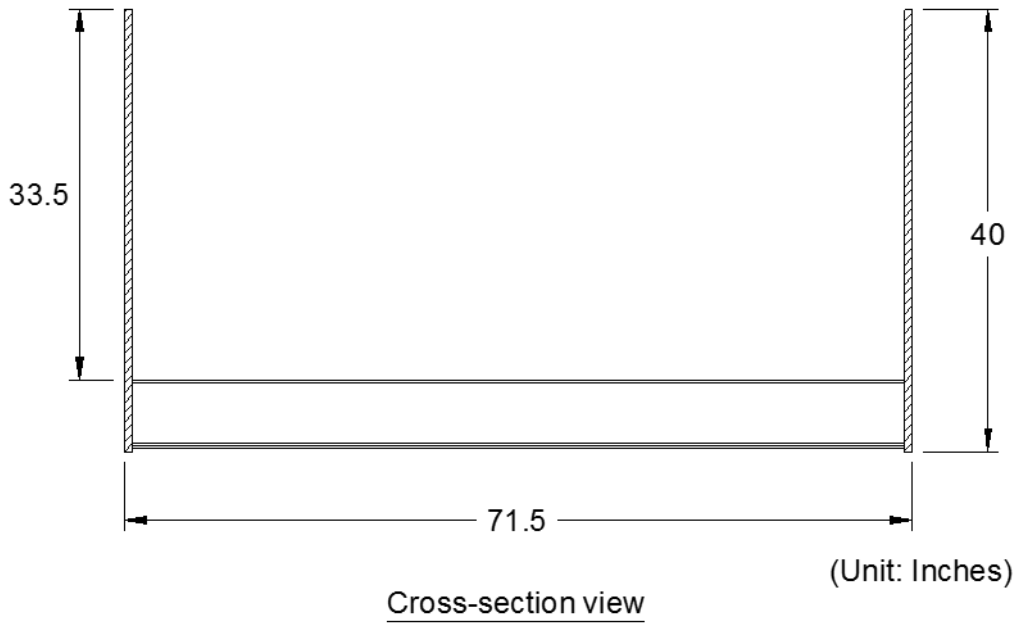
Dimension of the model spillway structure (9.3ft in length out of plane).
